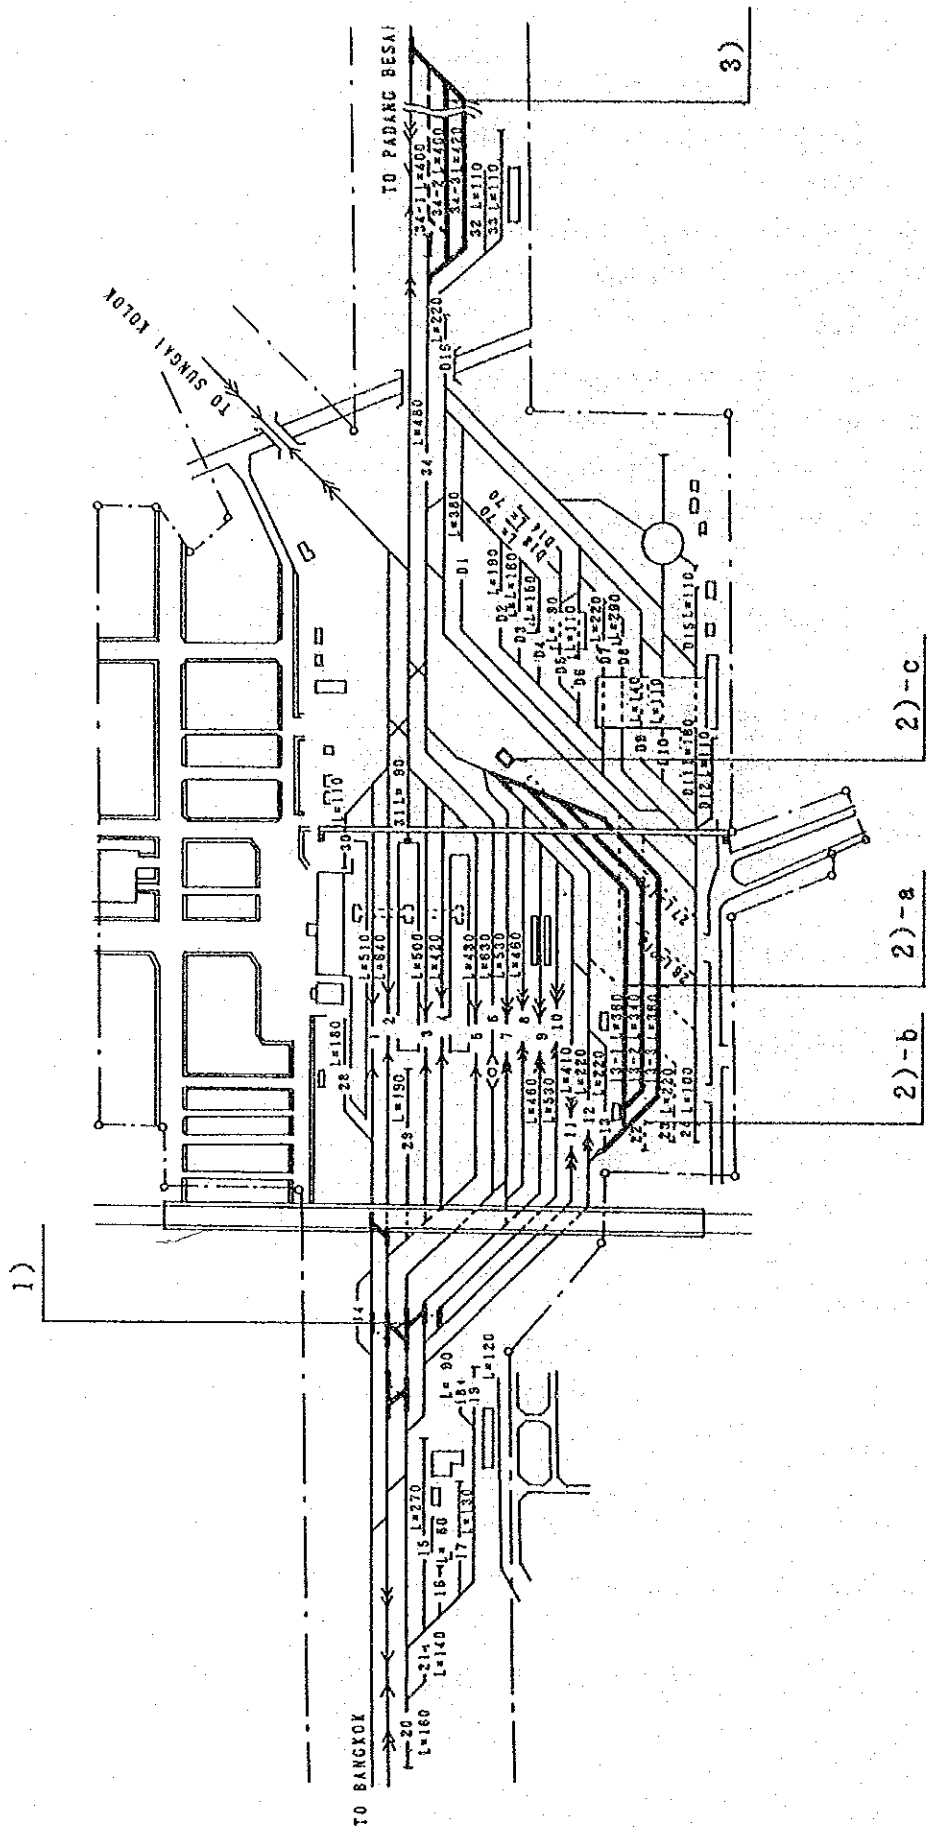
Future Track Layout at Hat Yai Station
